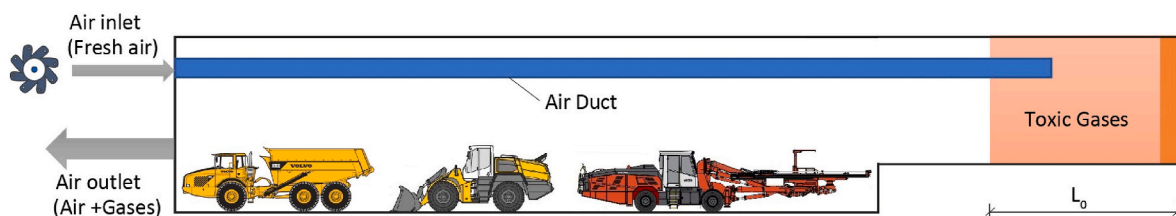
Section of the railway tunnel. Mobile equipment, ventilation system and noxious gases concentrate on the tunnel face.
